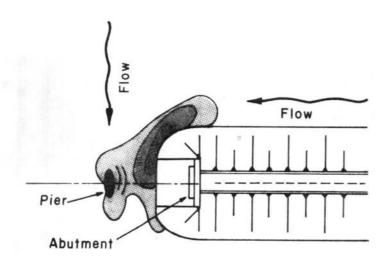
Typical scour at an embankment and adjacent pier
